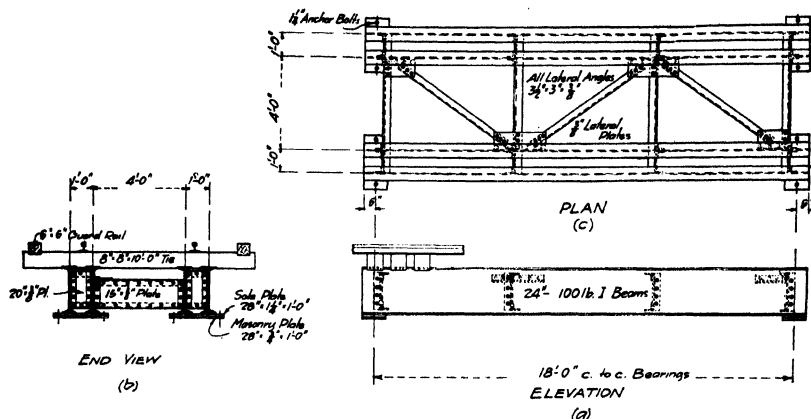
General drawing 18-ft. I-beam span, Coopers' E-60 loading.
